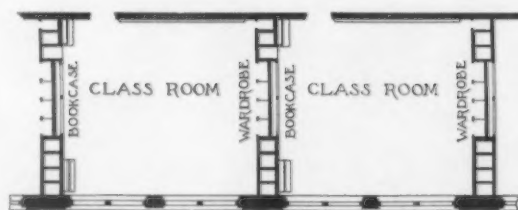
Plan of Class Rooms Showing Wardrobes in Ventilating Stacks
